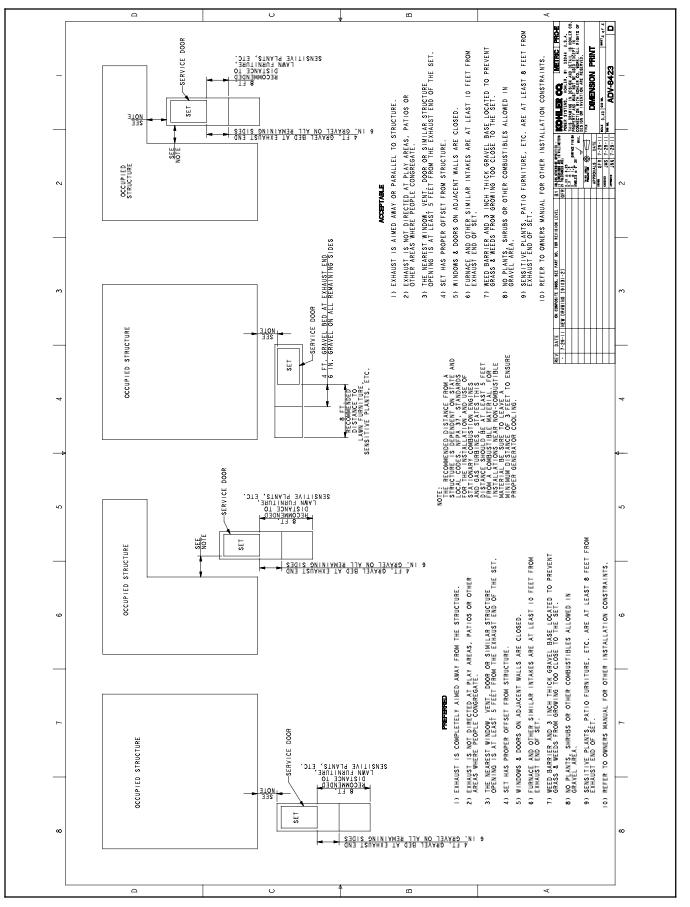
Dimension Drawing ADV-8423, Sheet 4
